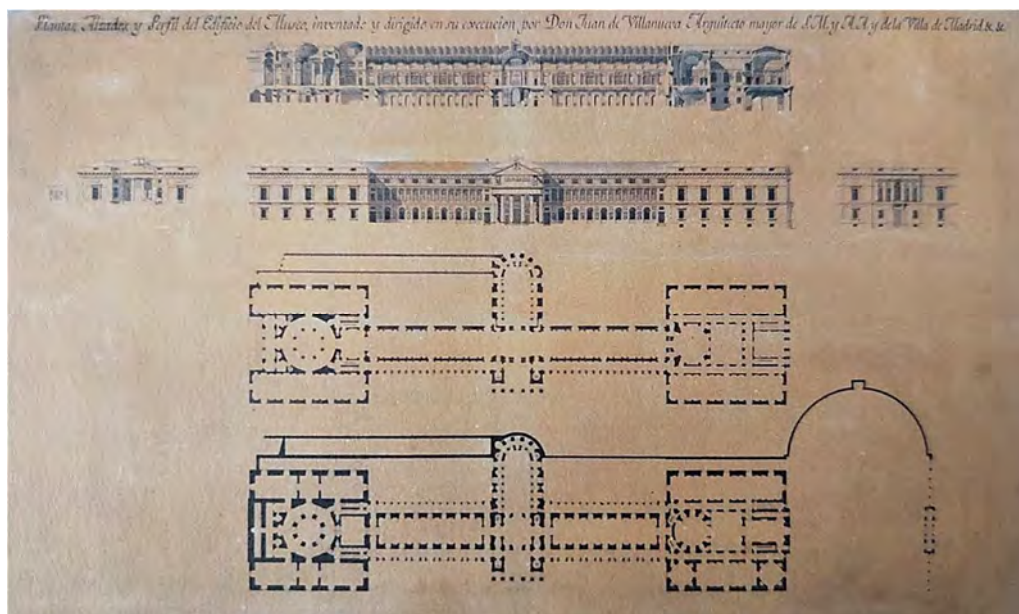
Juan de Villanueva. Plans, sections and façades of the Museum (1796).
